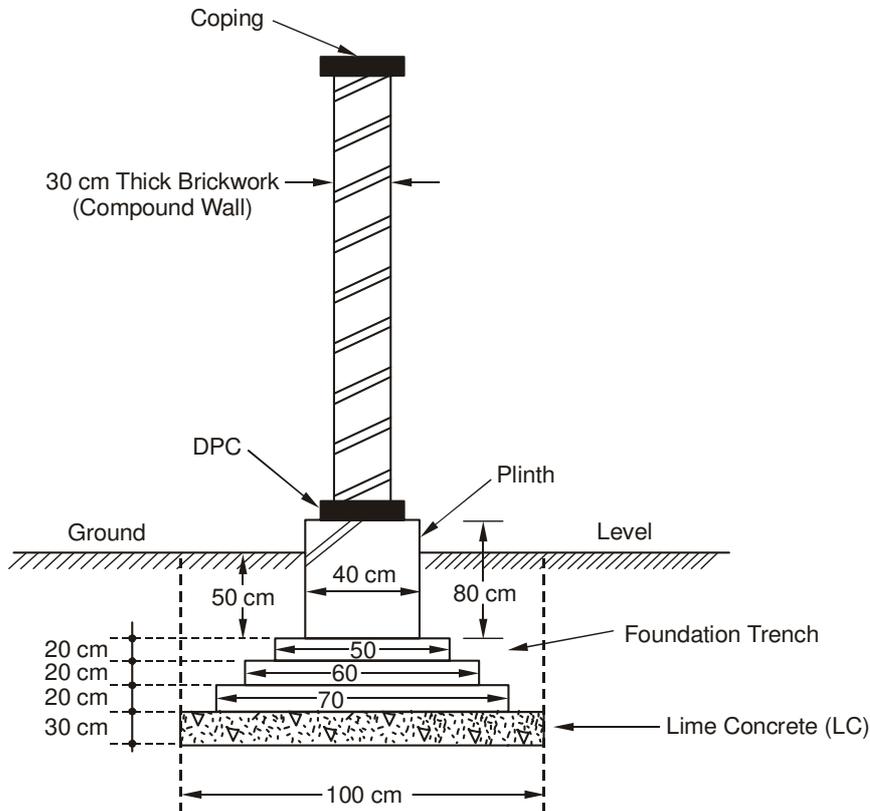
Section of a Straight Compound Wall in a Brickwork
